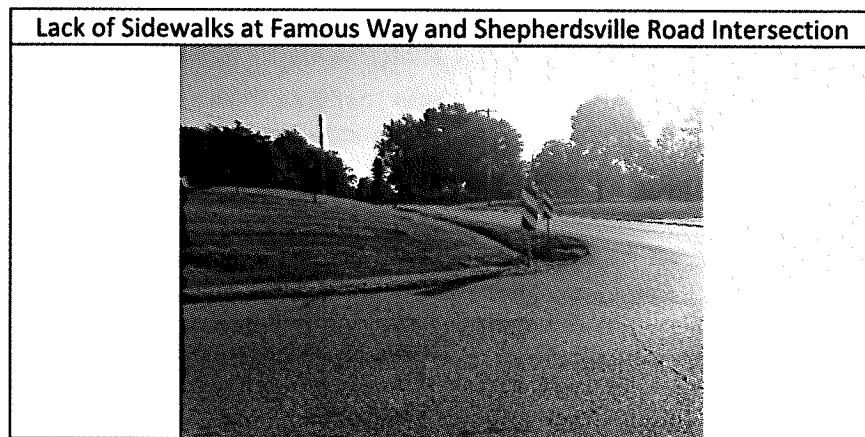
Lack of Sidewalks at Famous Way and Shepherdsville Road Intersection
